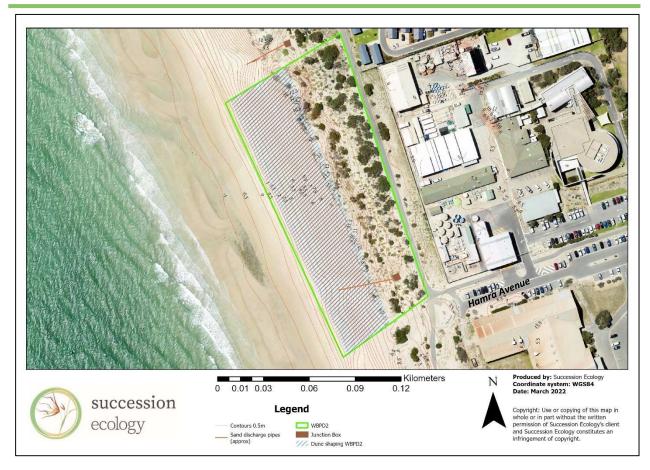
Location of proposed dune and crest shaping works within the WBPD2 sub-section (Zone 2).
